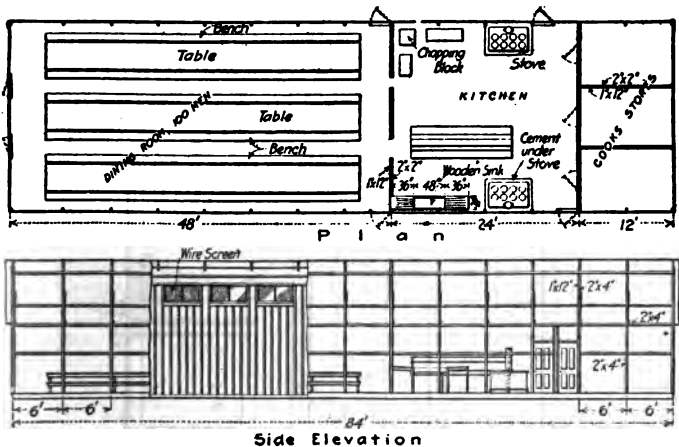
Cook House and Dining Room, Torrance Construction Camp.
